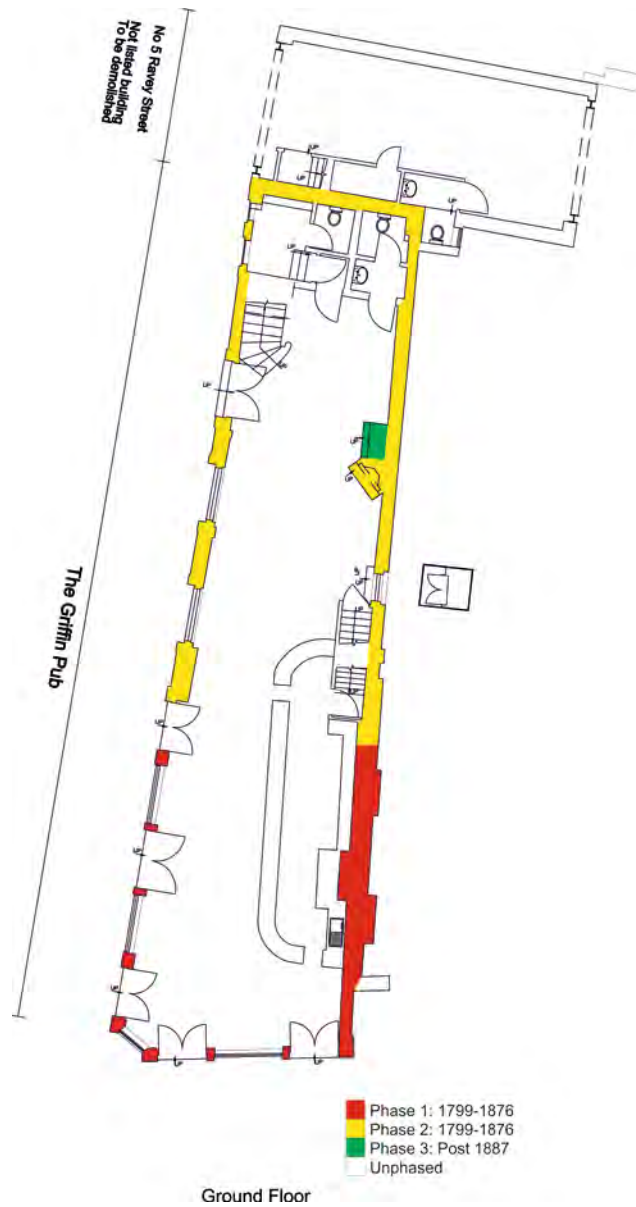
Phase Plan, Ground Floor, 1:200 @ A4
